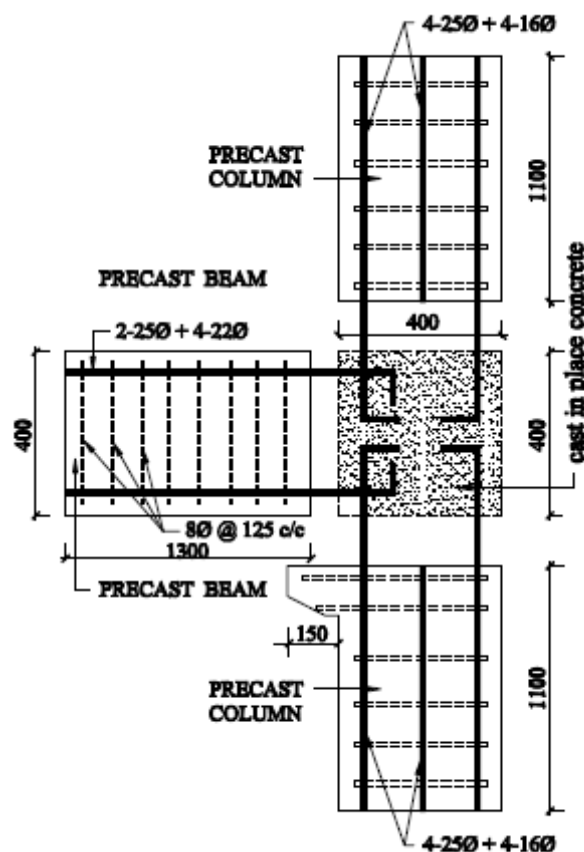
Elevation of precast specimen P.C.-1
